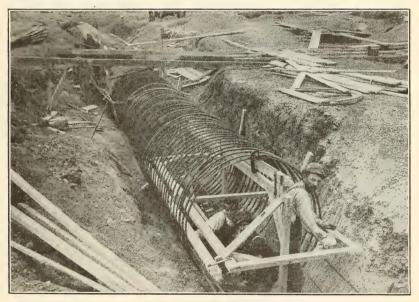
Showing one method of building continuous reinforced-concrete pipe.
